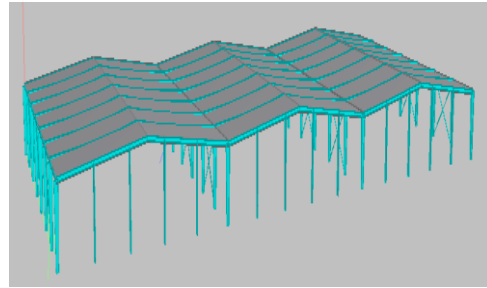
PROPOSED PEB MODEL BY STAAD.Pro
